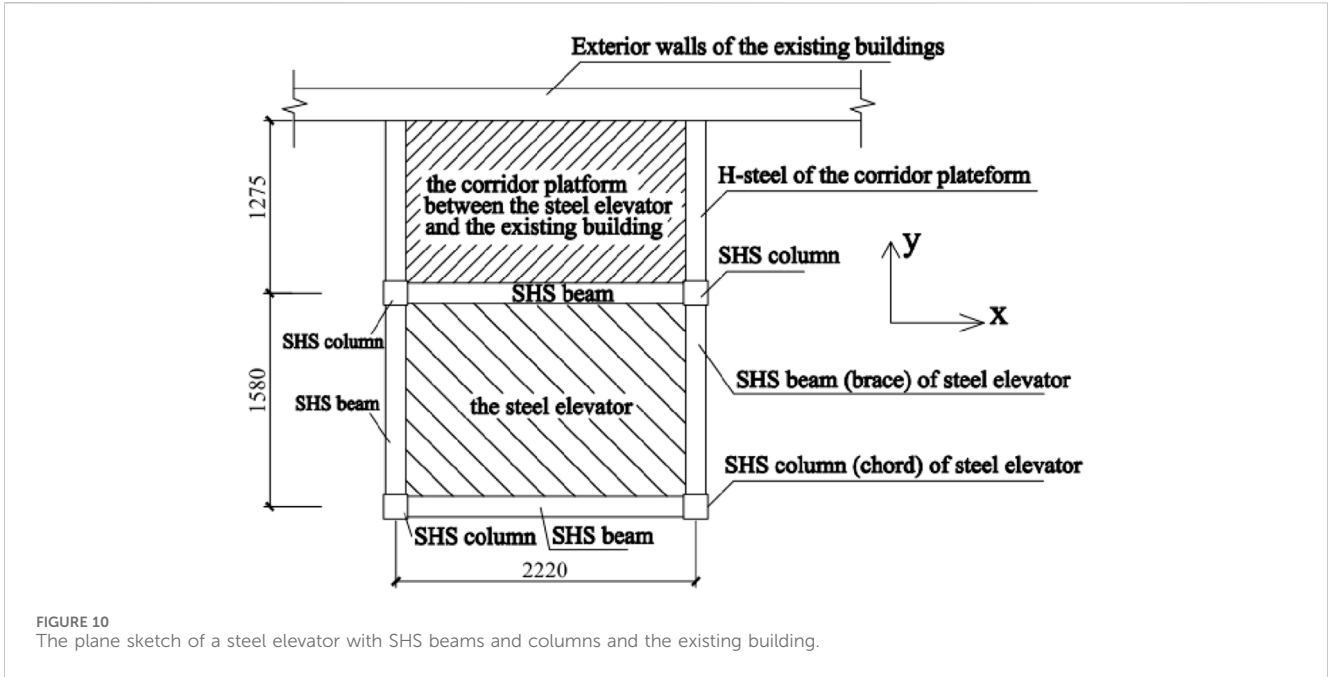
The plane sketch of a steel elevator with SHS beams and columns and the existing building.
